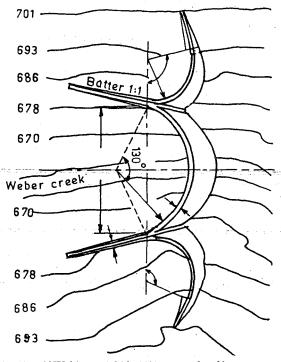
Site plan of Webber creek dam (an example of long span-multiple arch dam).
